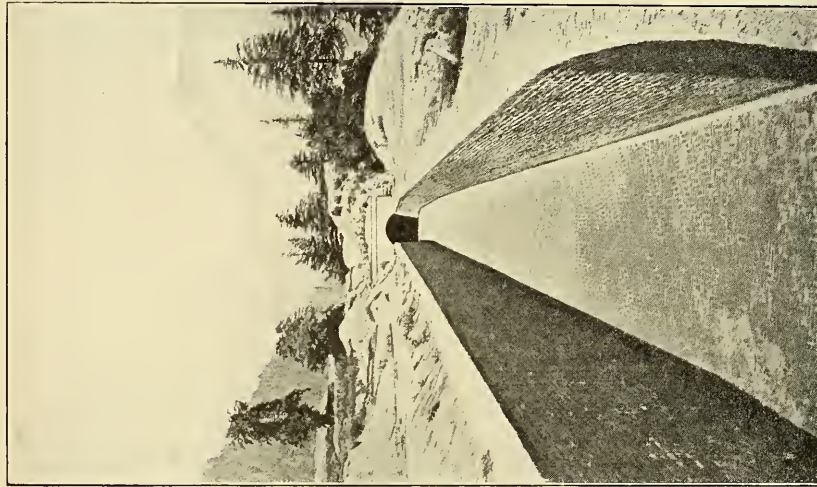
MASONRY-LINED CONDUIT; IN BACK-
